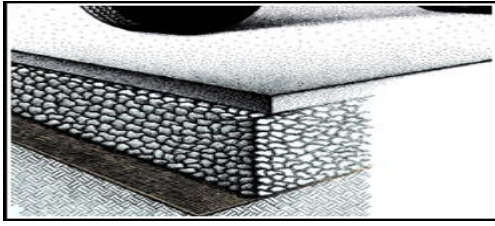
a Reinforcement of subgrade soil for paved and unpaved roads
